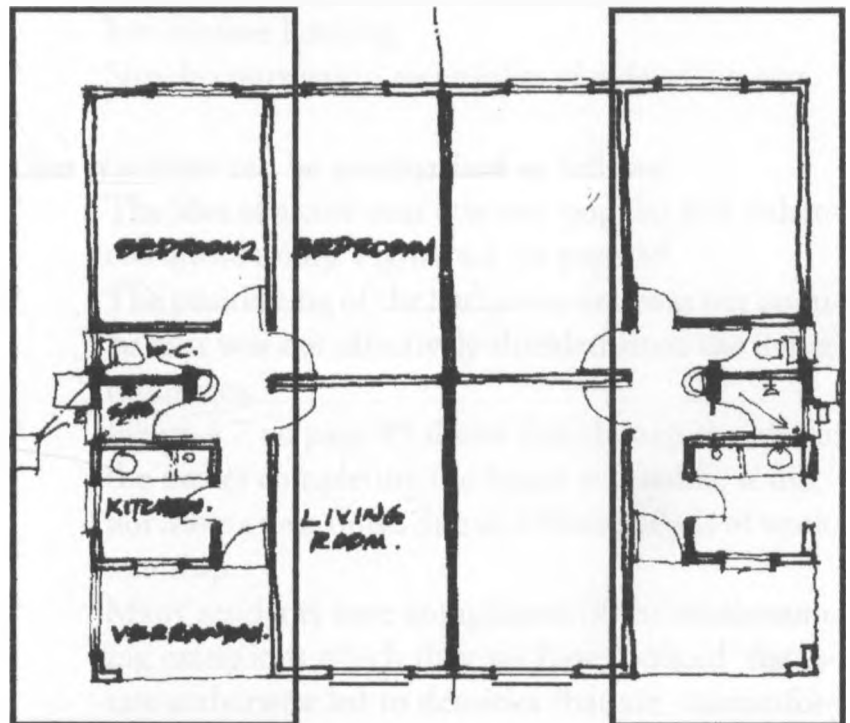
Typical Completed Floor Plan in Ayany Estate. The area in the box would first be done then the completion would come later, by the owner.
